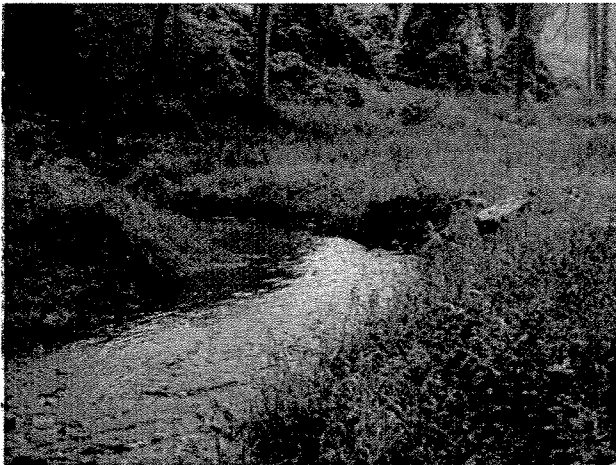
Looking upstream at rock J vane installed at MS Station 62+44. (9/27/04)
